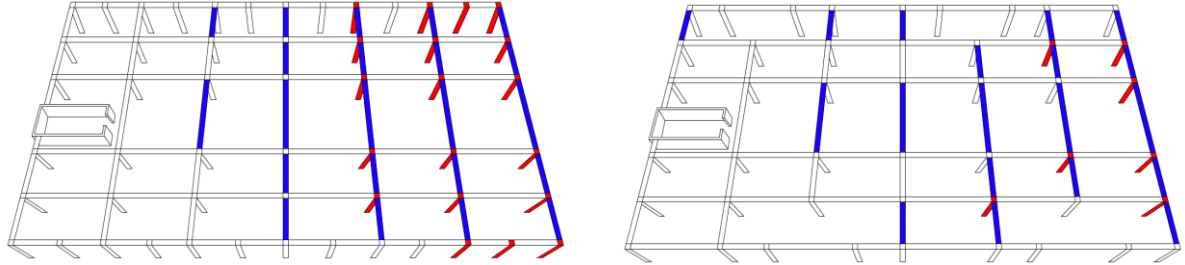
Location of the structural elements in unsafe conditions in current state (left: ground storey, right: first storey).
